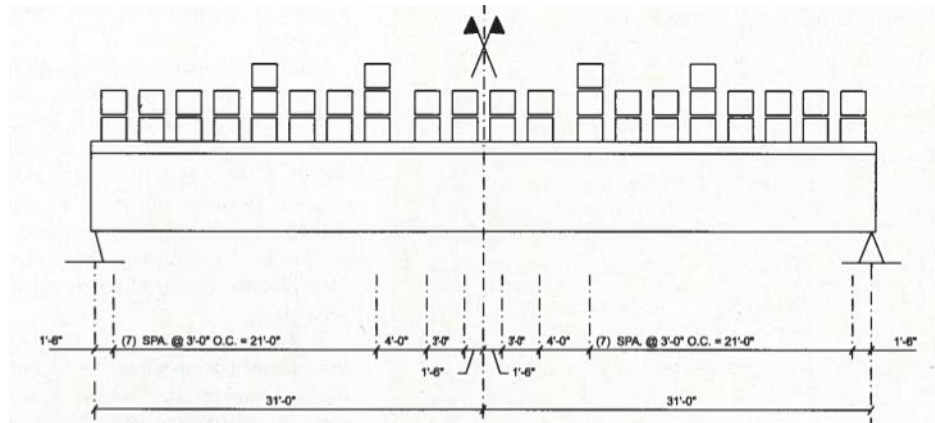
Failure loading pattern for specimen one (Aswad, et. al., 2004)
